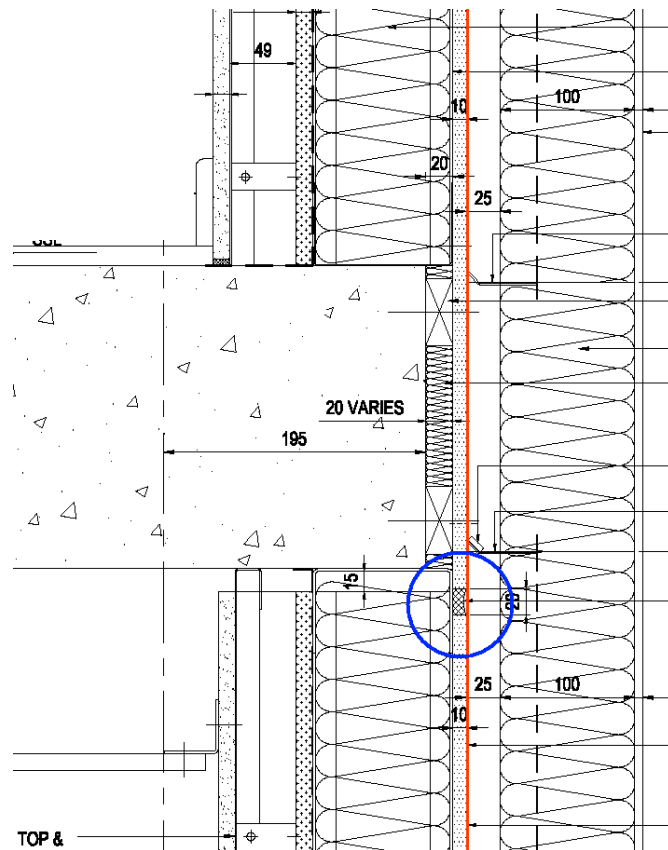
Membrane fixed to sheathing continuous across floor slab, movement joint
